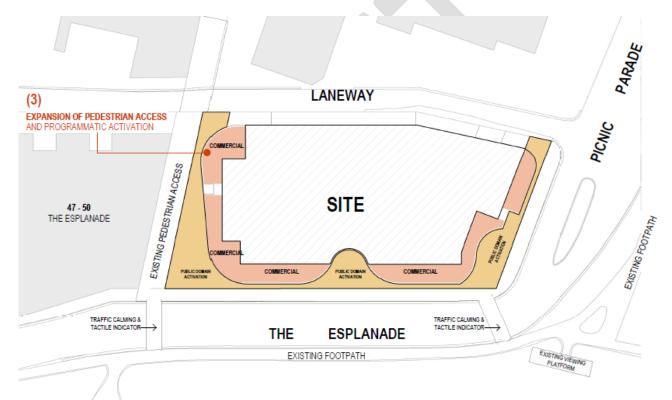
Plan showing primary active street frontages along The Esplanade, Picnic Parade and the existing pedestrian laneway to the west
